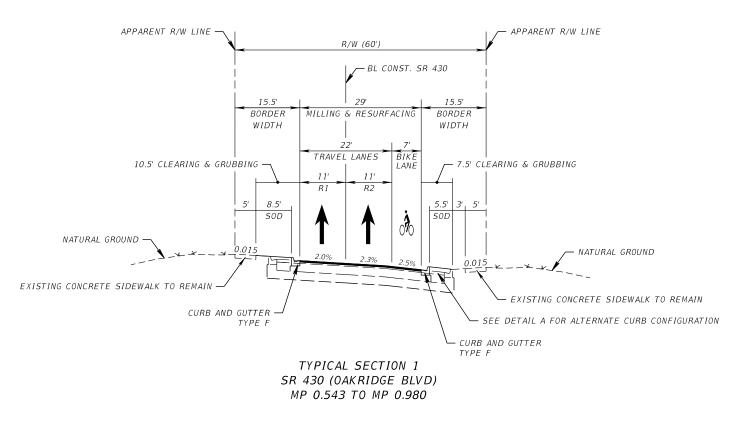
SR 430 (Oakridge Boulevard) Existing Typical Section
